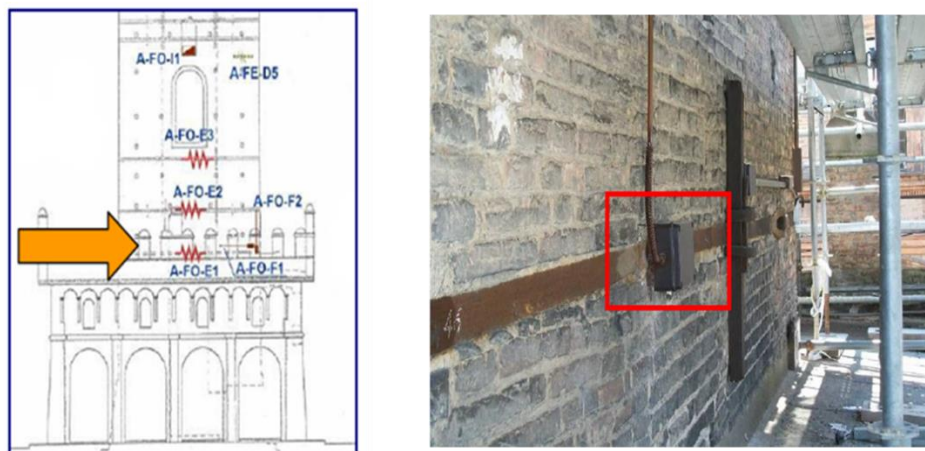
Vibrating Wire Spot Weldable strain extensometers (E1)
